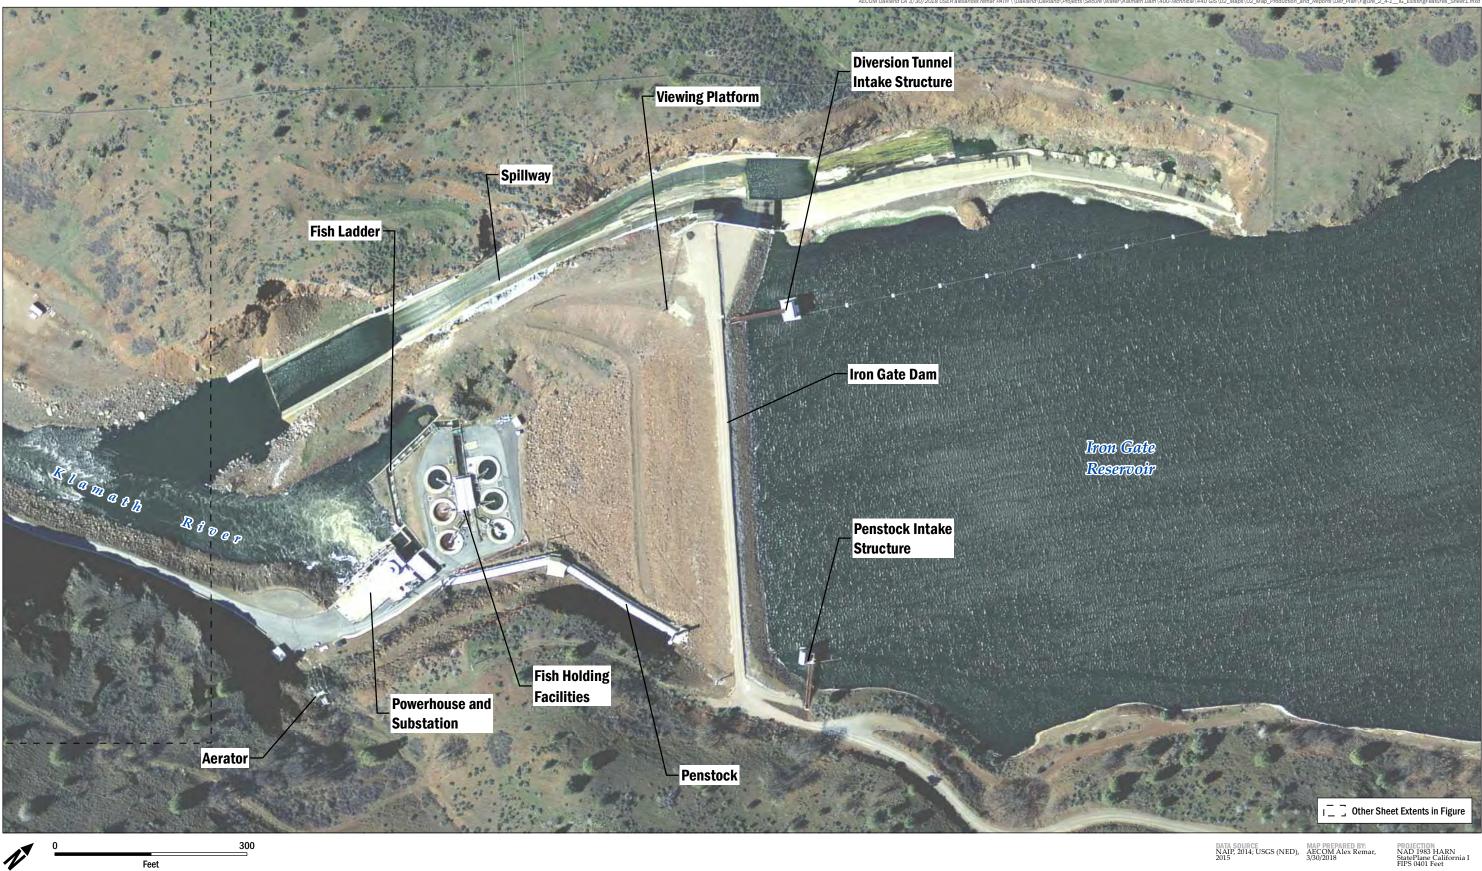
Iron Gate Dam Existing Features Sheet 1 of 2
